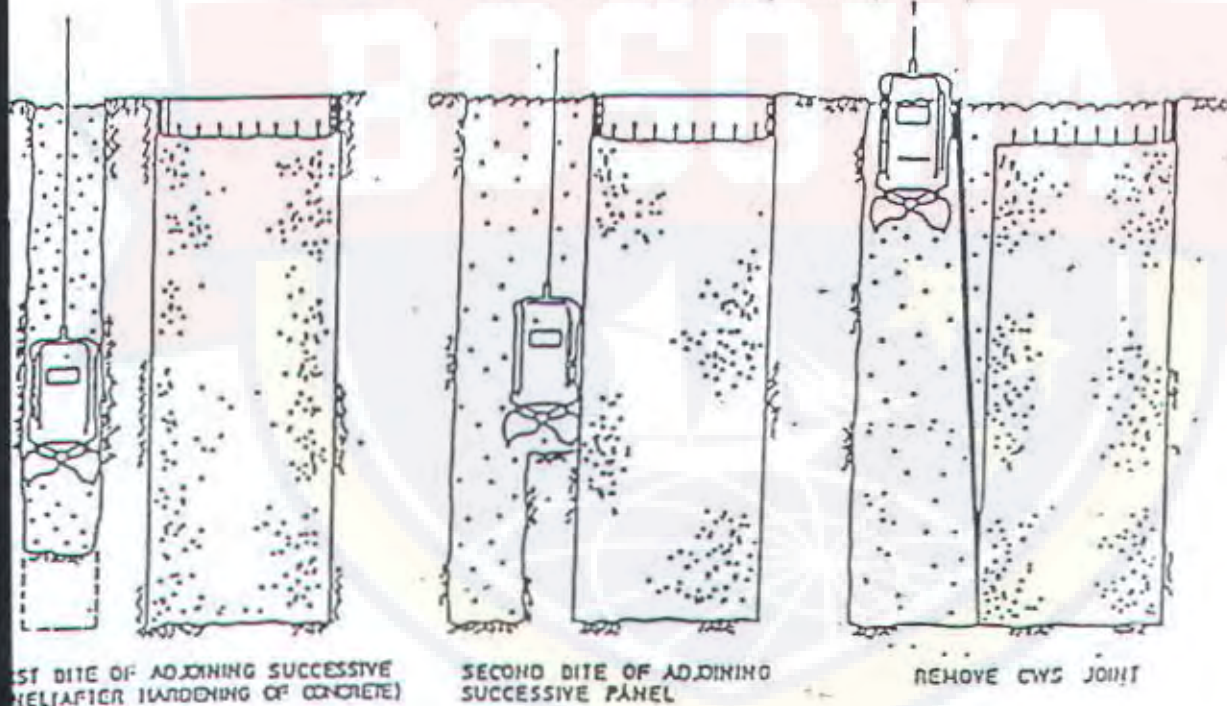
FIGURE : EXCAVATION OF ADJOINING PANEL AND REMOVAL OF CWS JOINT
